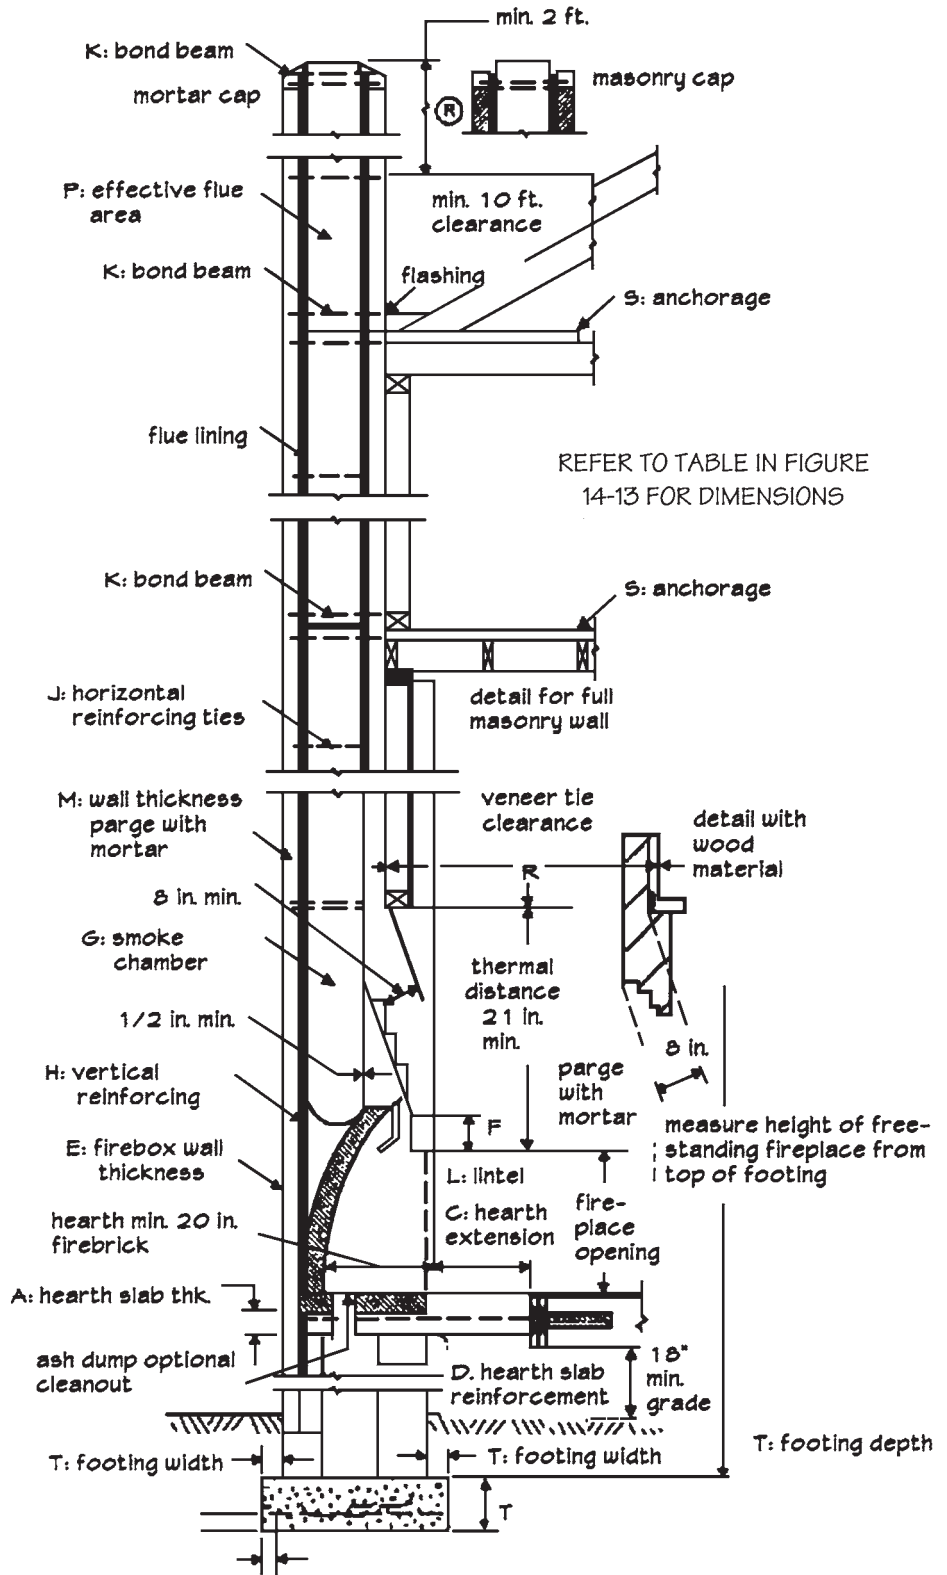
Section detail, fireplace on wood framing. (From International Building Code 2003.)
